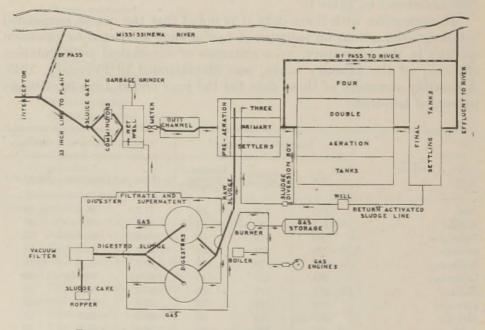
General plan of sewage treatment works at Marion, Ind.
